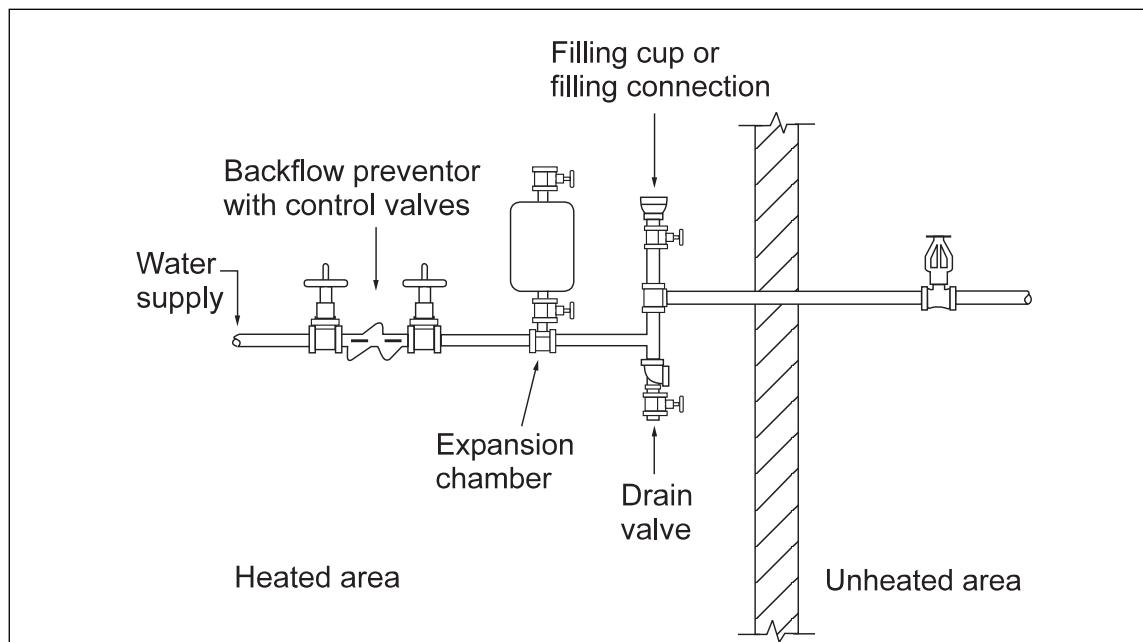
Antifreeze solution sprinkler system piping arrangements connected to a potable water supply
